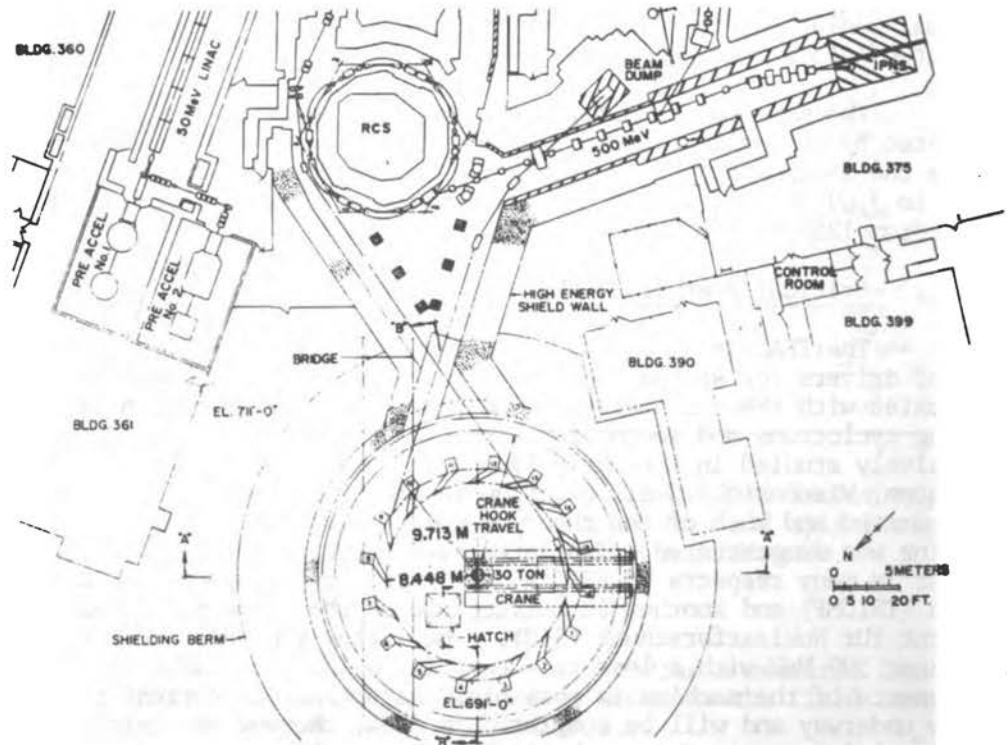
Mini-ASPUN Layout on IPNS Site Plan
